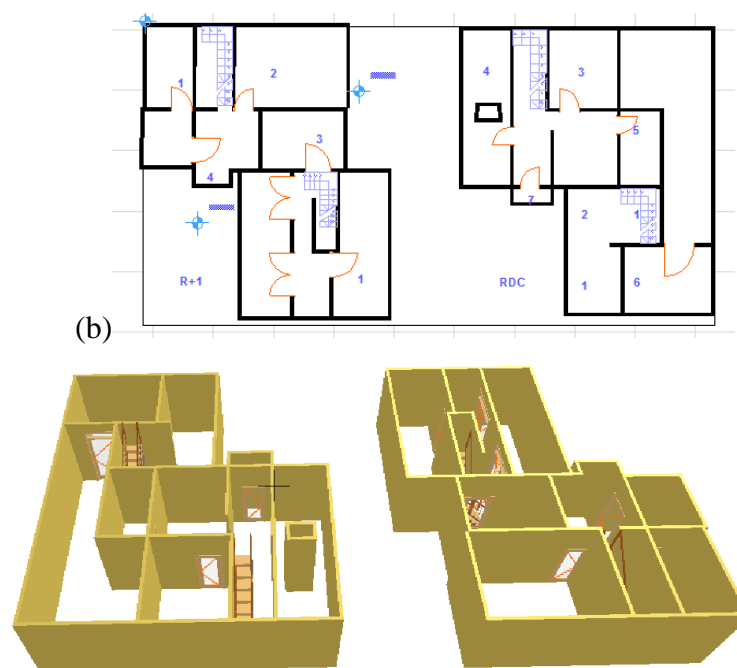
Courtyard in traditional house type (b) plan and 3D of Ksar Bousemghoun (Author, 2021)
